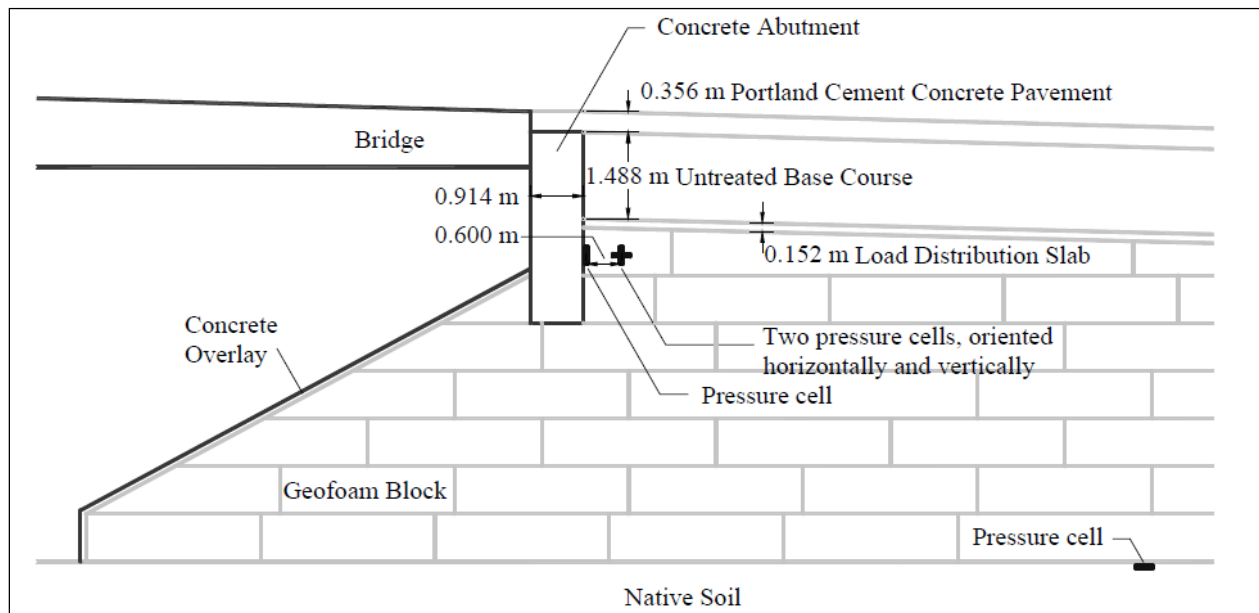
Geofoam Cross-Section (parallel to bridge) at the West End of the State Street Off Ramp.
